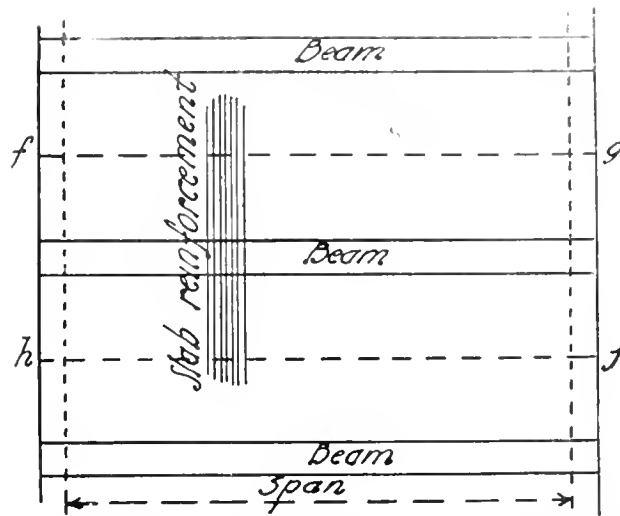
Beams Running in One Direction Only—Beams and Slabs Cast as Units—Planes Midway Between Beams.
